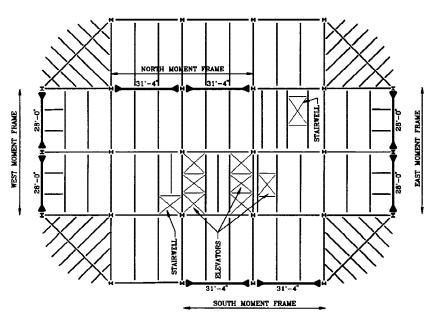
TYPICAL FLOOR PLAN OF STRONG COLUMN BUILDING
